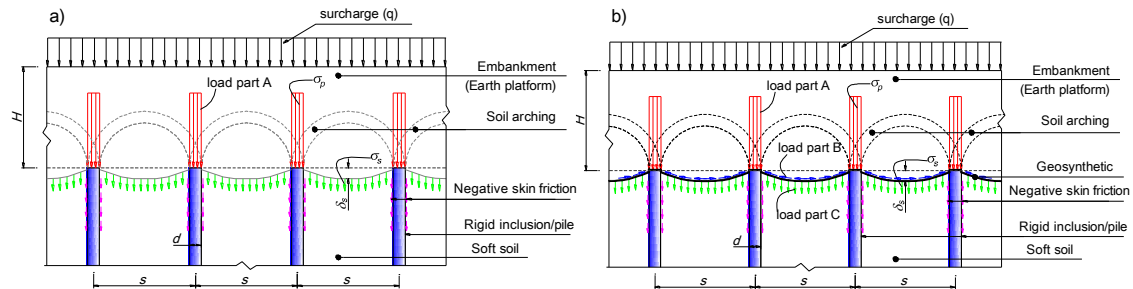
Load transfer mechanism of the systems: a) Piled embankment; b) GRPS embankment
